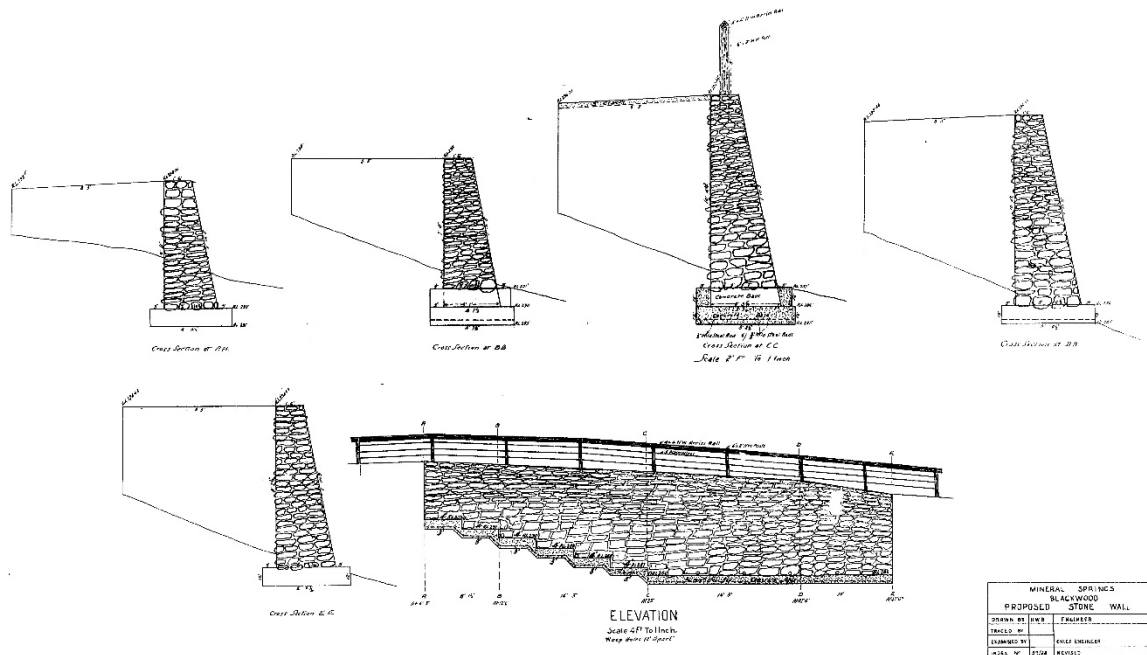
Mineral Springs Blackwood: Proposed Stone Wall, n.d. [1939].
